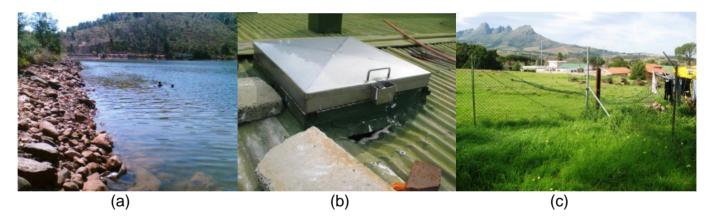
Examples of hazards identified from site visits: (a) site access (e.g. children swimming); (b) contamination threat (e.g. broken reservoir roof); (c) site access (e.g. reservoir fence damaged to use as a walkway)
